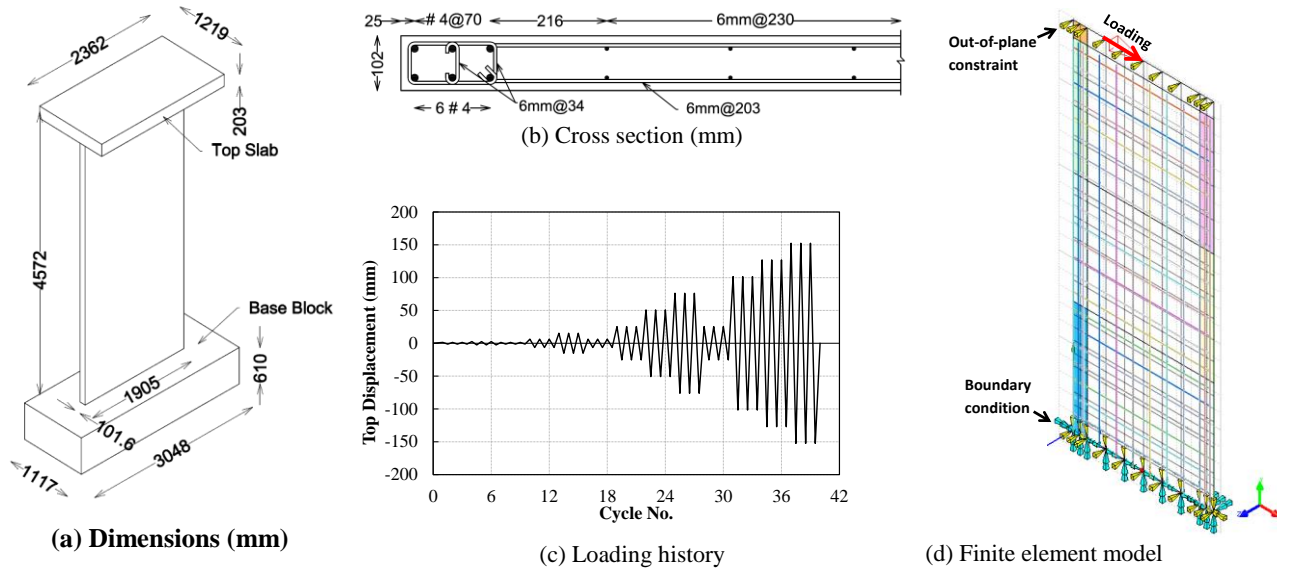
Wall specimen R2 (Oesterle 1976)
